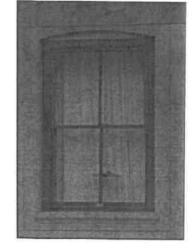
Vertically proportioned window with plastered window sill and simple plaster-band forming a flat arch above the window
